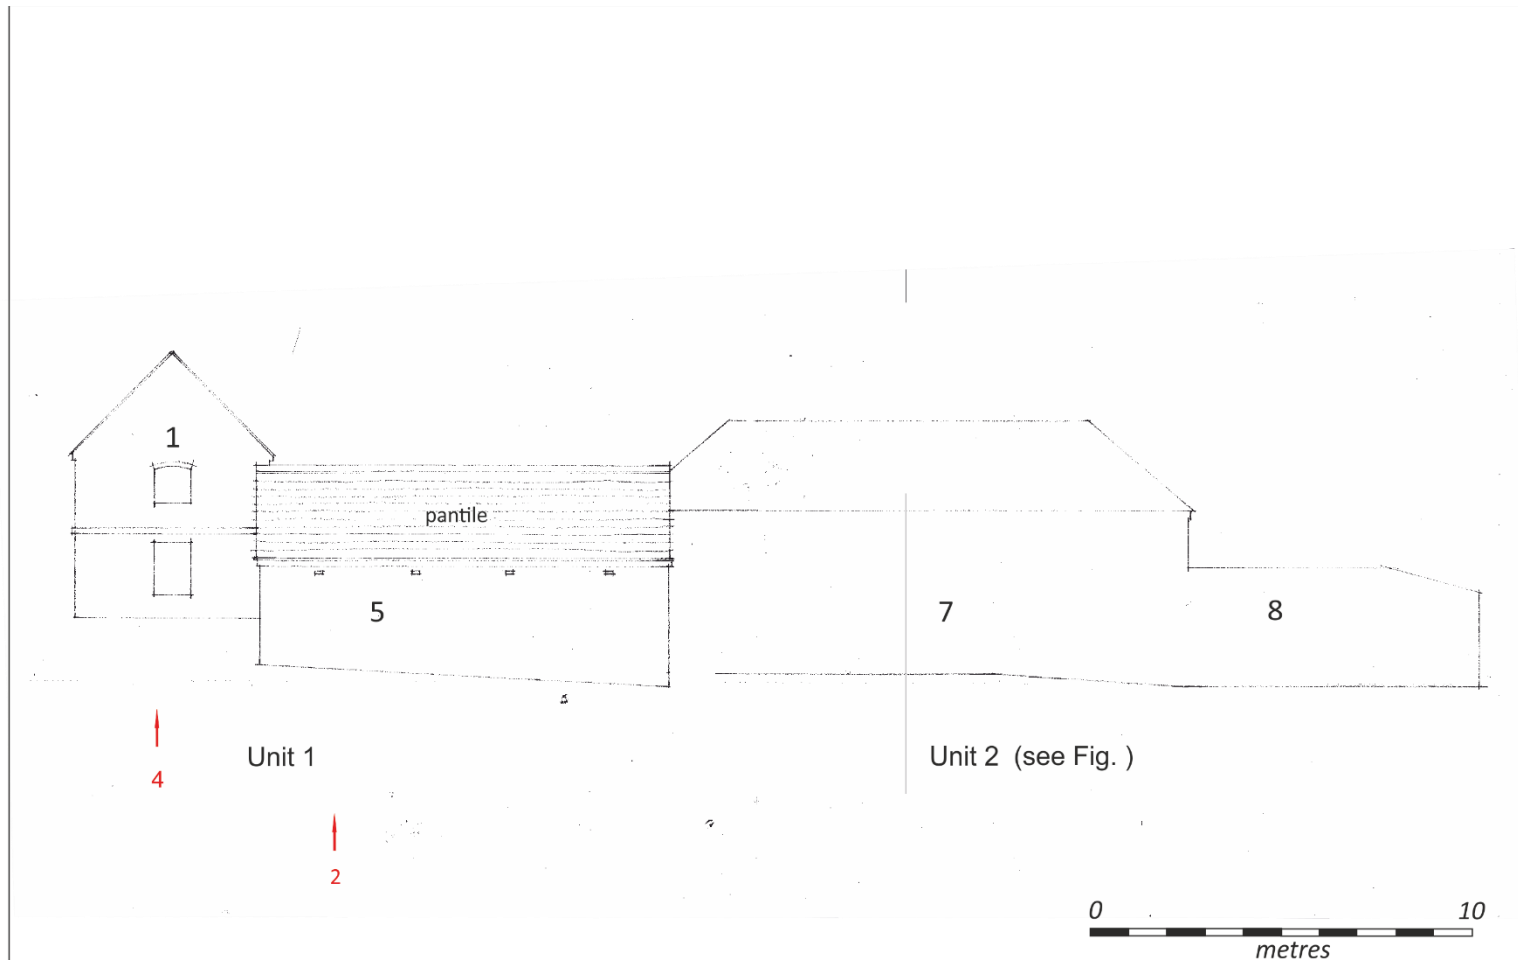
Unit 1 North-east elevation. Numbered arrows show direction of photographs . See Appendix 1
